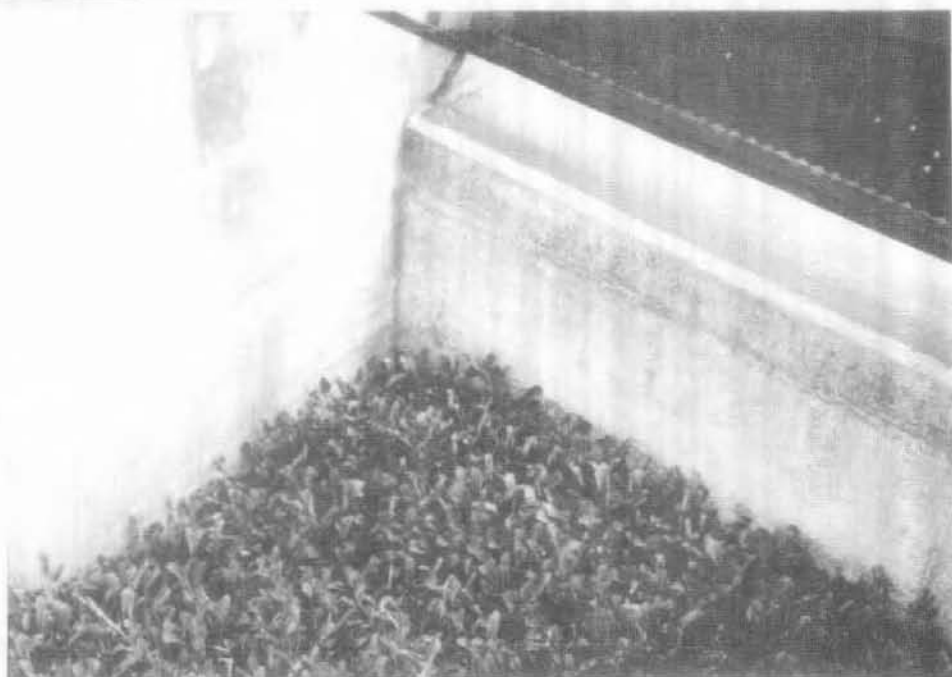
Debris blocking flow through Structure No. 3 (looking downstream)
